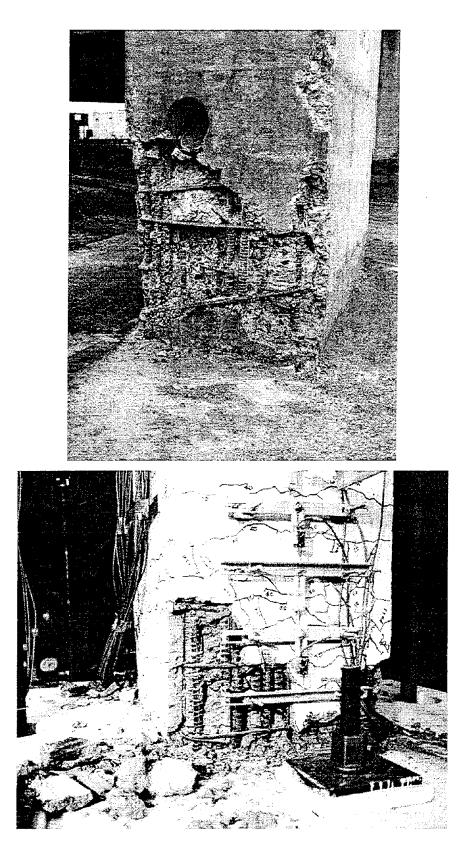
Lap Splice Bond Failure During Loma Prieta 1989 and in the 40 % Scale Laboratory Tests
